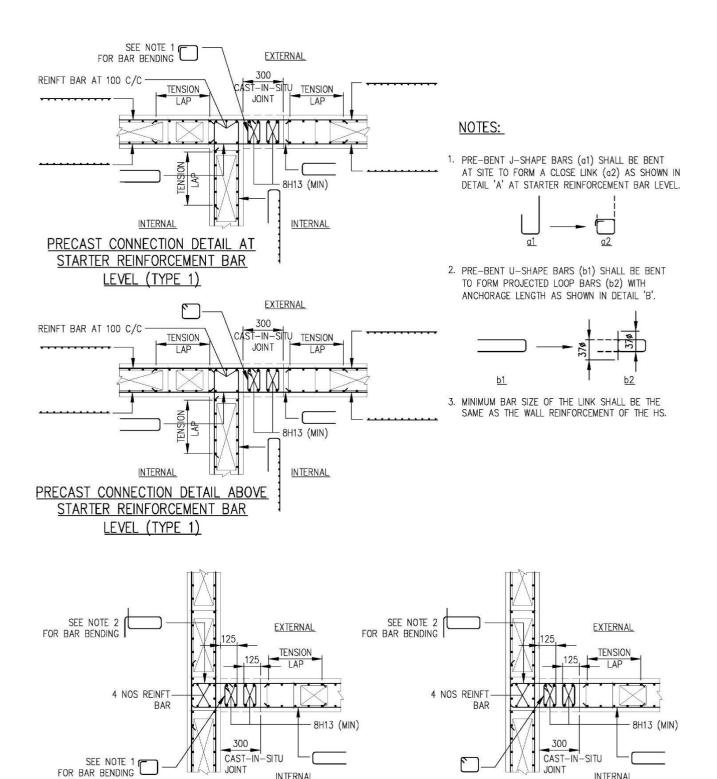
(e) REINFORCEMENT BAR DETAILS OF WALL AND RIB FOR C-SHAPED PRECAST HS
